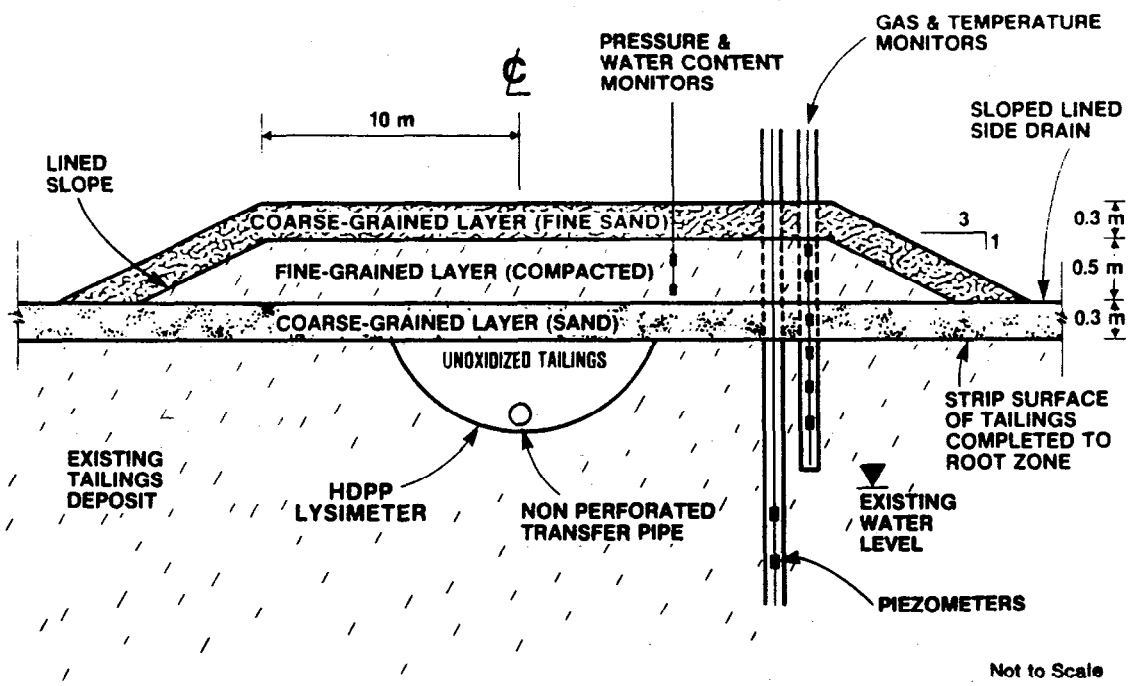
Transverse Section A-A' through Composite Soil Cover
